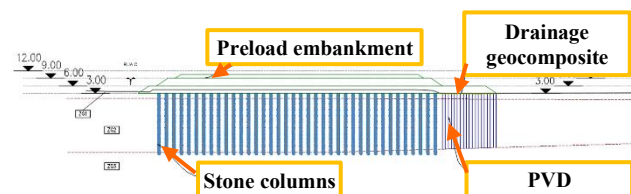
Typical cross section of the consolidation ground improvement solution (not to scale).
